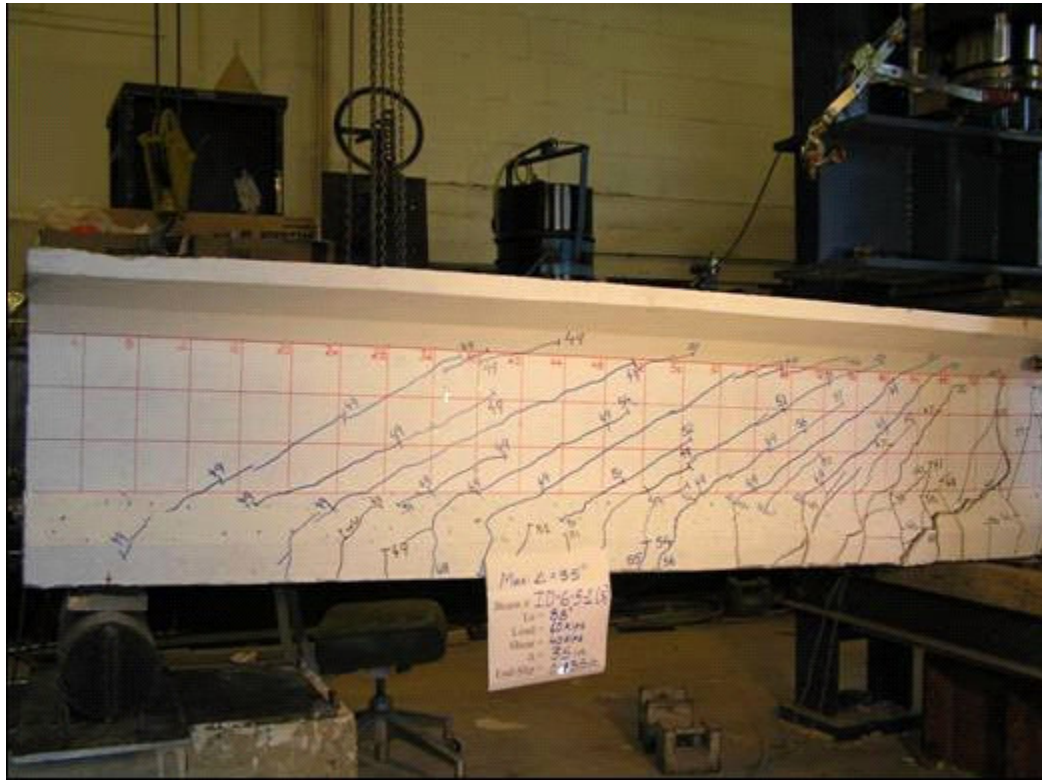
Photo of South end of beam ID-6-5-1 showing the cracking pattern at the maximum deflection
